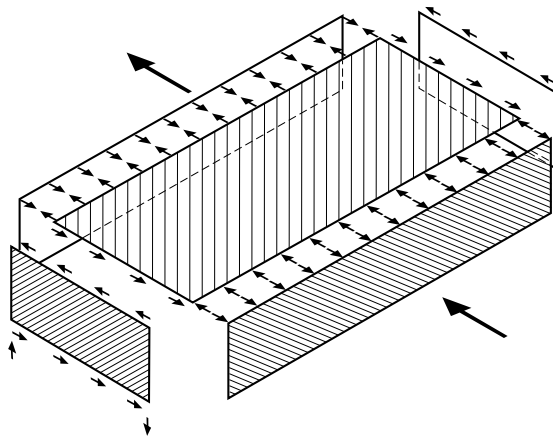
In-plane load-bearing in a simple building, where the roof functions as a horizontal diaphragm and the side walls function as vertical diaphragms = shear walls. (STEP 1995 Article B13)
